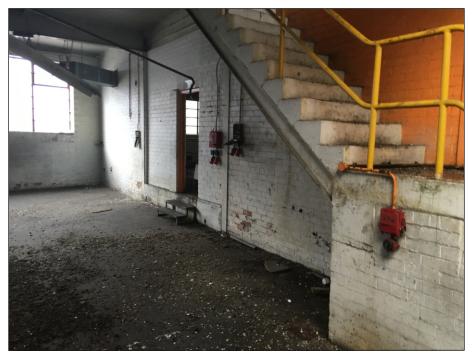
Eastern side of the ground floor of Building 13, looking south-west
